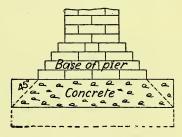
Diagram explaining Depth of Concrete under Pier.
